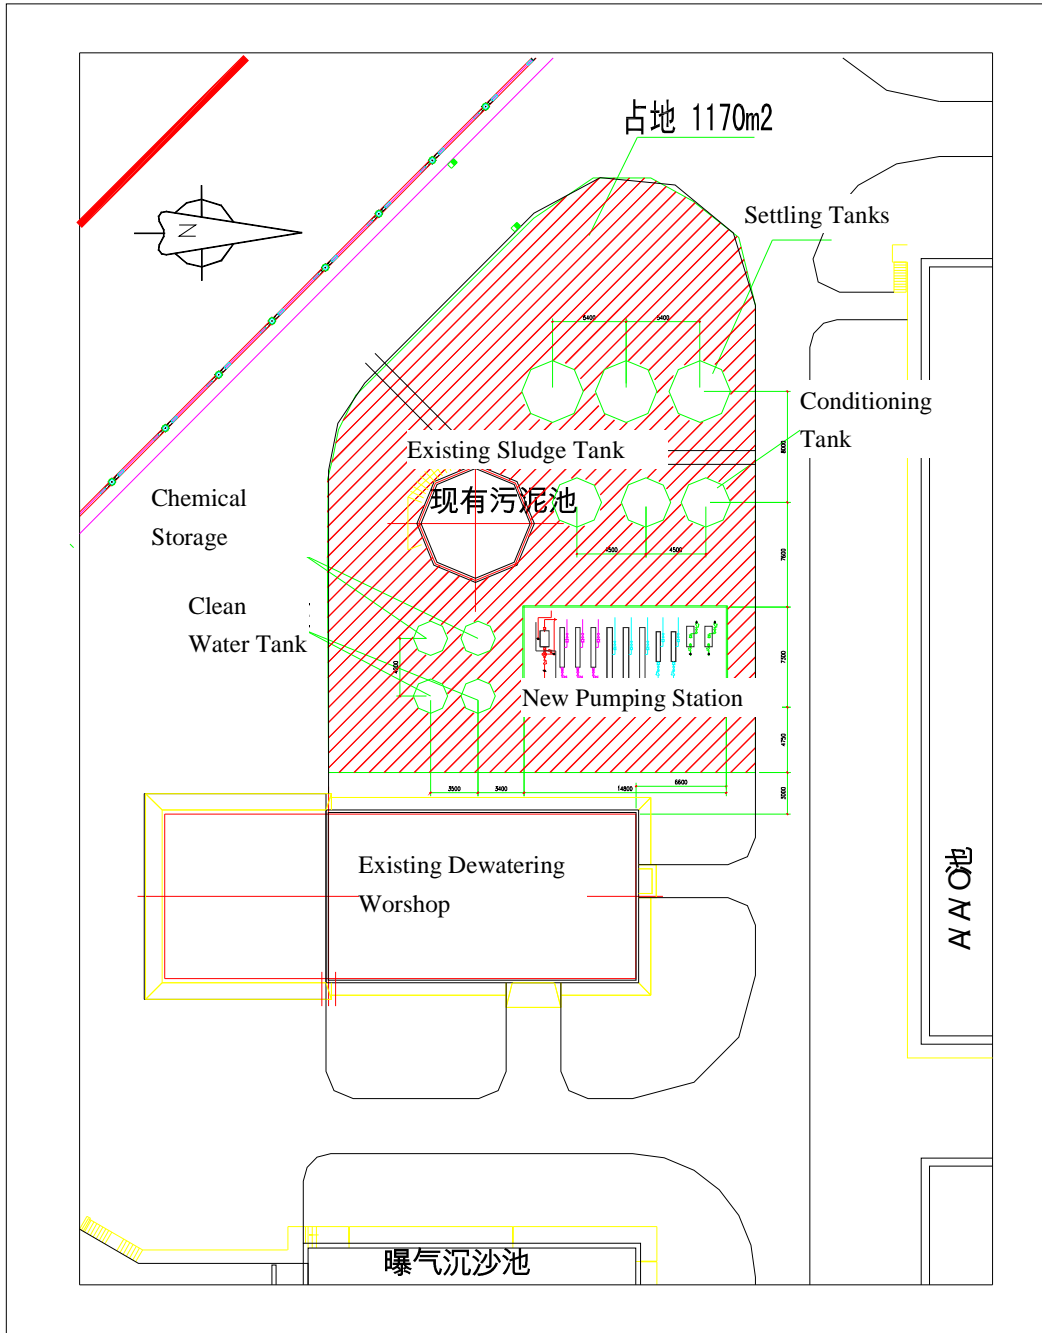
Layout of Shagang WWTP Sludge Dewatering Workshop Scale1:500
